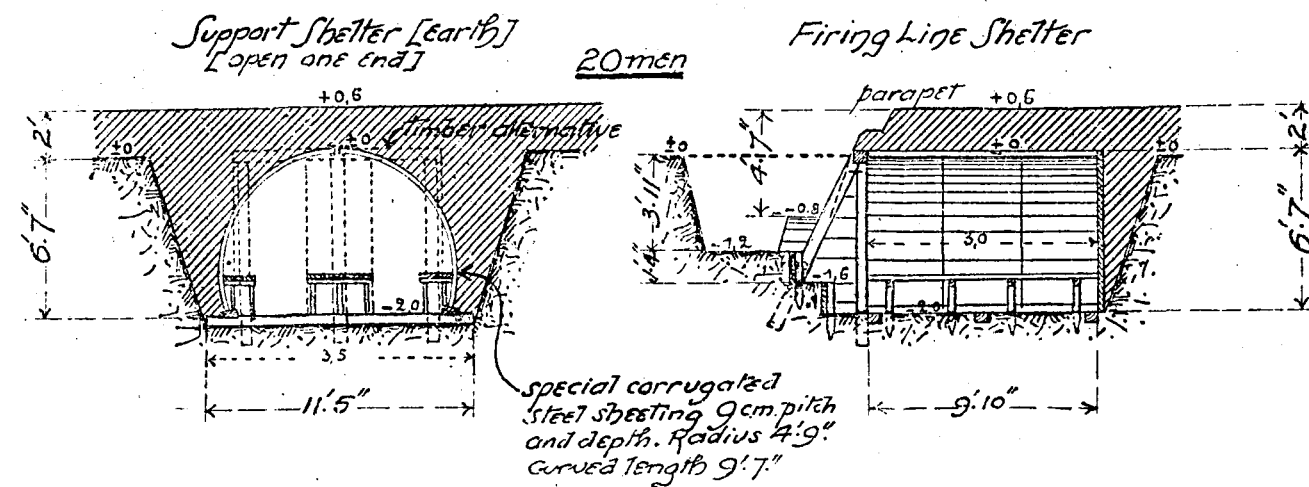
Splinter-Proof Shelters under Parapet (Russian).
